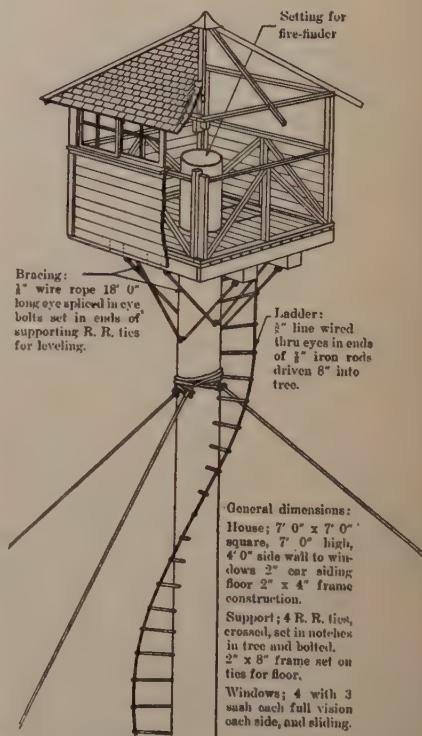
Plan for tree lookout tower, Quinault Indian Reservation, Washington.
